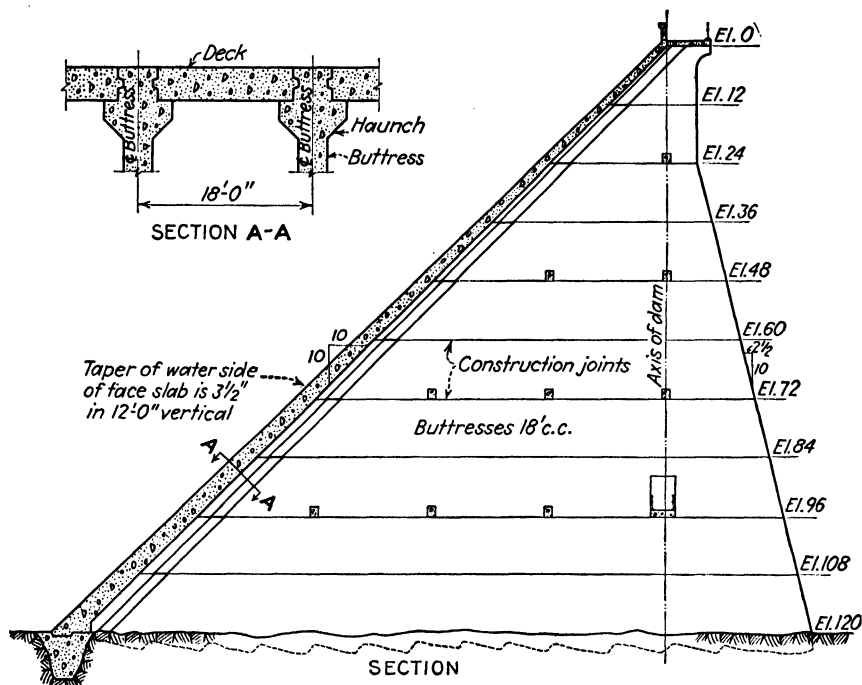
Stony Gorge Dam. Bulkhead buttress and sections.
